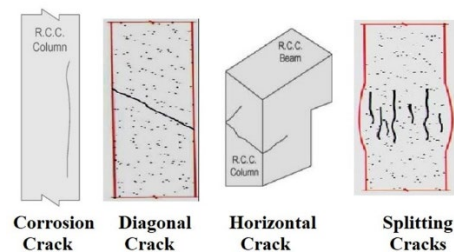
Different Types of Cracks on Reinforced Concrete Structures
